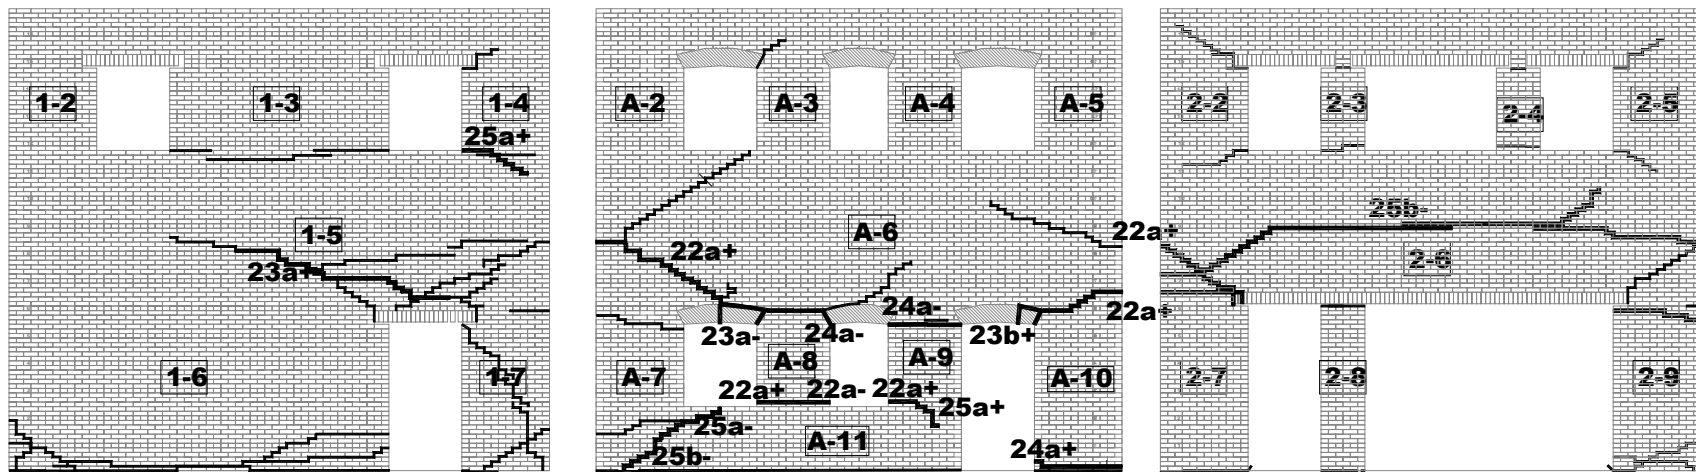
Crack pattern of Wall A and adjacent Wall 1 (left) and Wall 2 (right) at the end of Cycle 25b. The crack number corresponds to the test run number. Number IDs of each pier are given in the rectangles.
